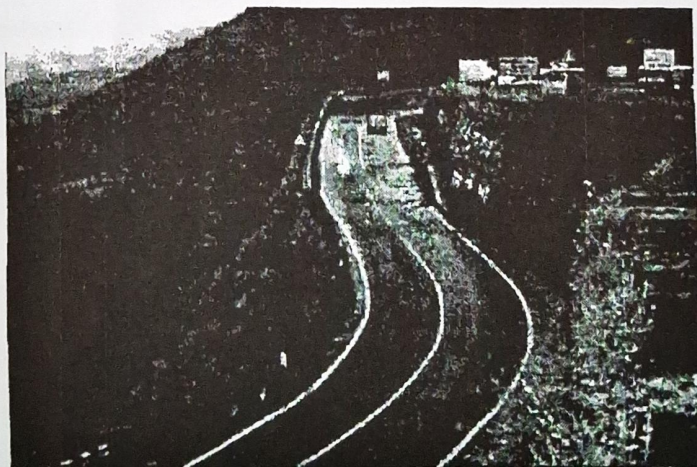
First Stage Development of Retaining Wall (Stone Masonry)
